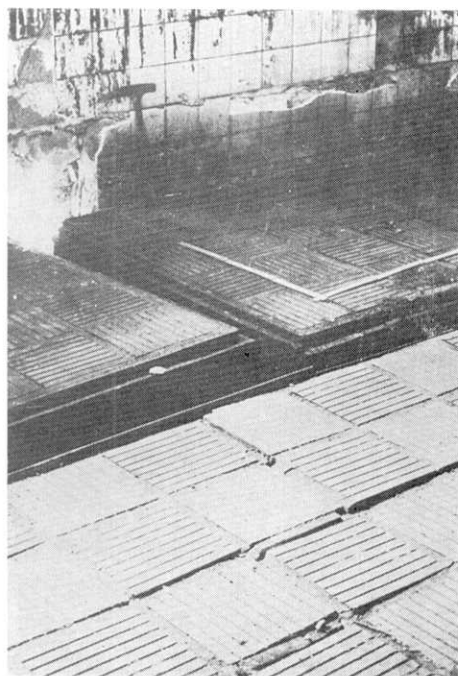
A crack in the floor of a restaurant and the destruction of a block wall at loc. S-22.
